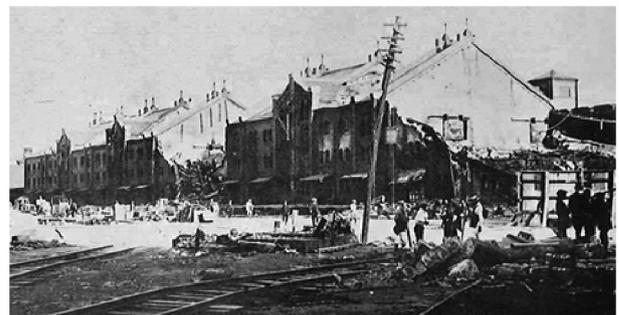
Masonry buildings damaged in the Great Kanto Earthquake in 1923 [5].
